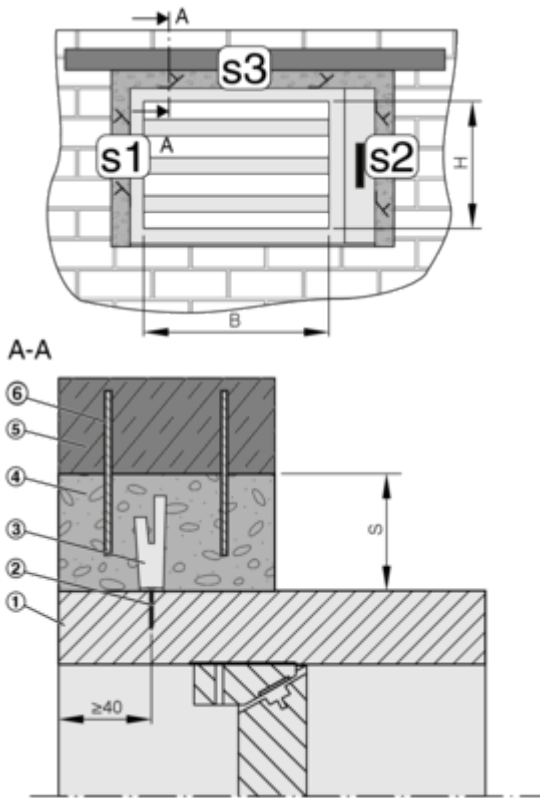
EK-JZ mortar-based installation with wall fixing tabs
